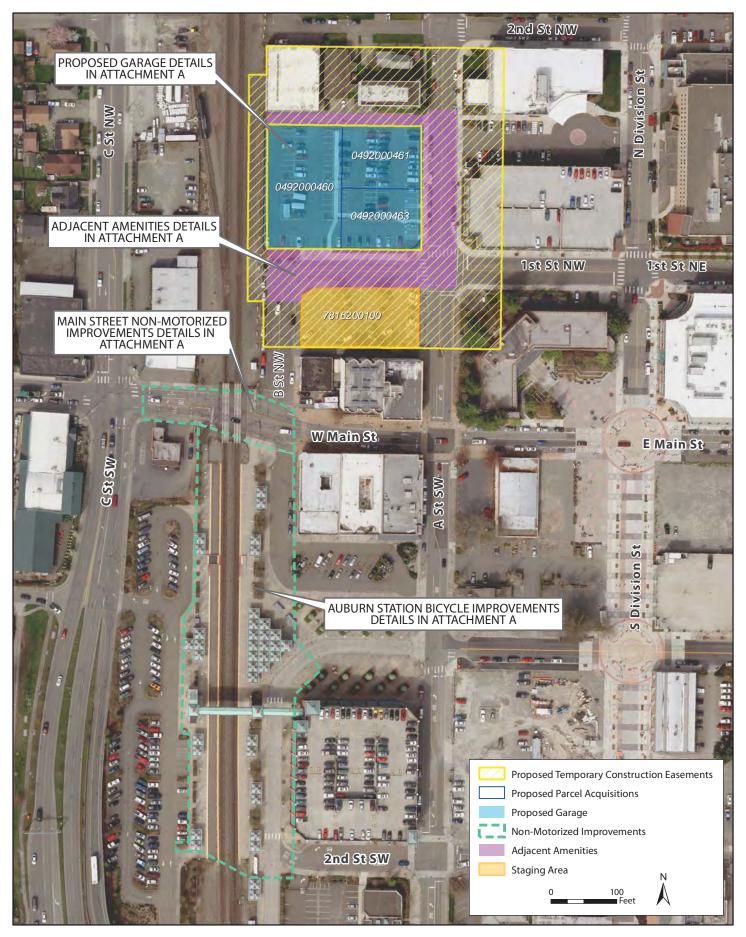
Site Plan Auburn Station Parking and Access Improvements Project
